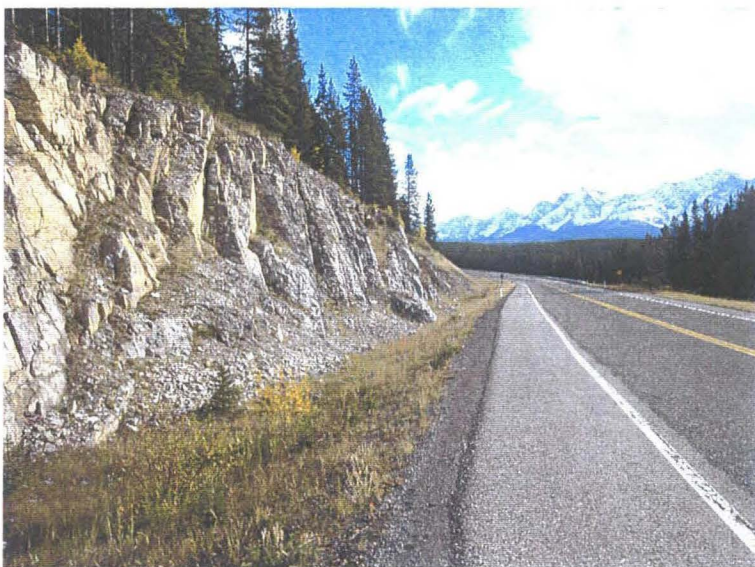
(bottom) – Facing south across the Mount Wintour Rock Cut site. Note how the vertical bedding faces in the exposed rock are nearly parallel to the highway.
